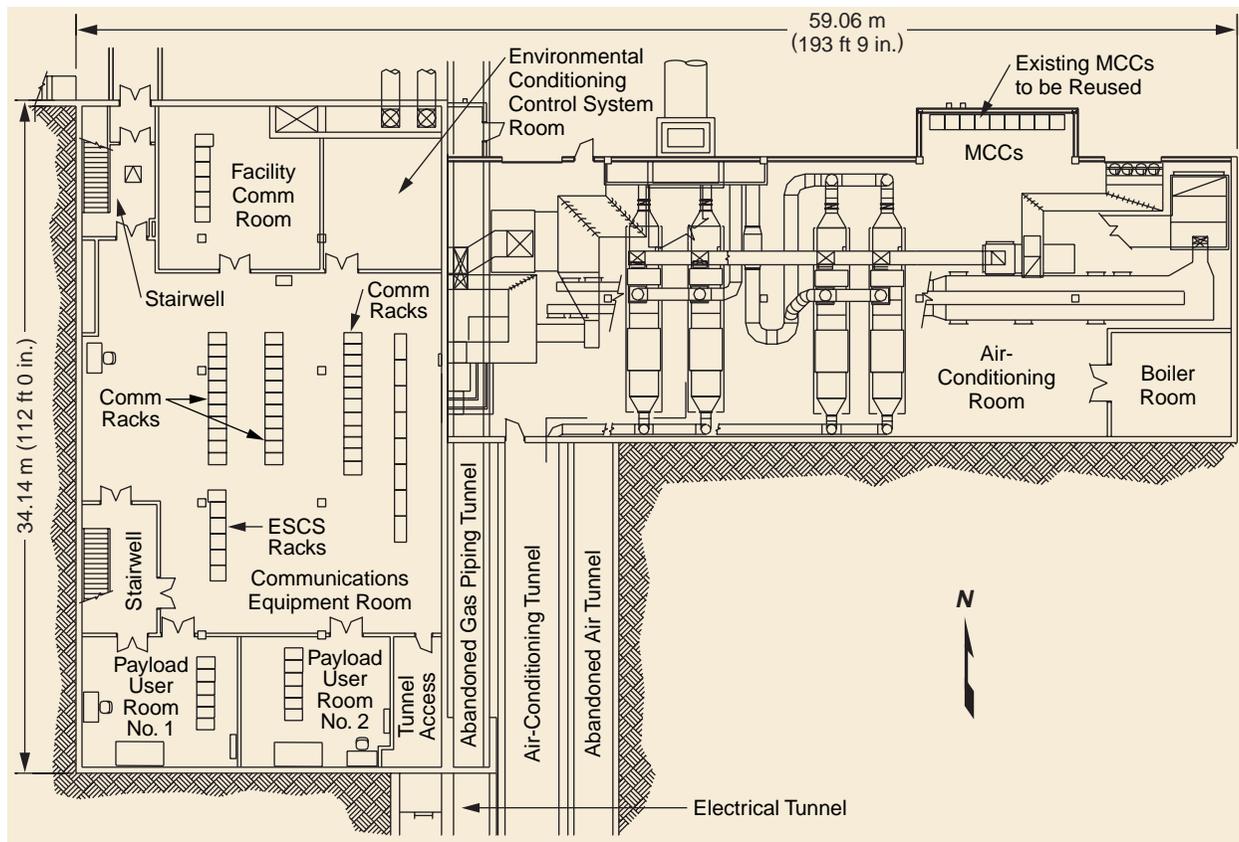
Support Equipment Building (SEB) (Building 395) First-Floor Plan
